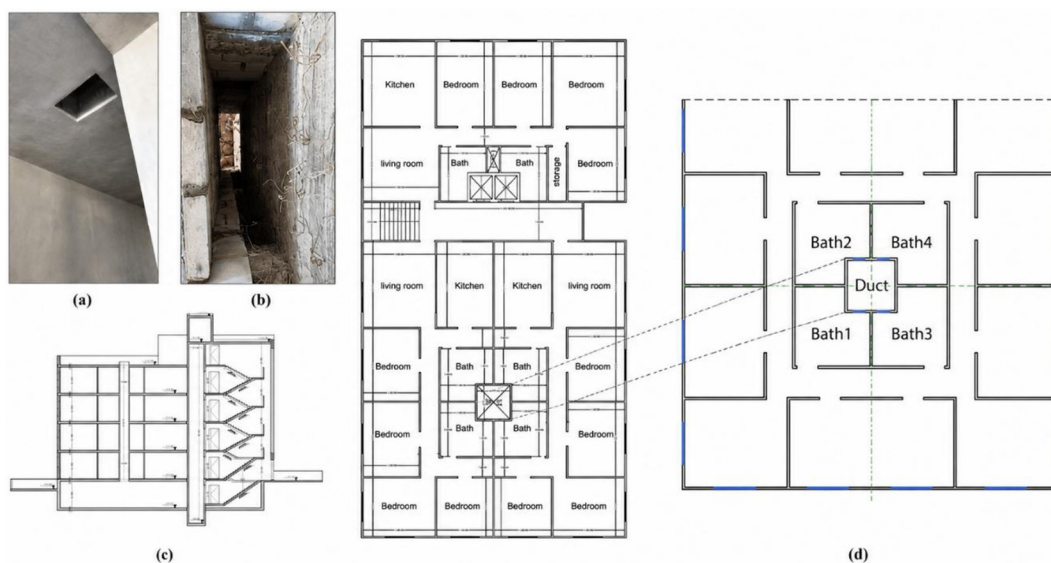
Field and geometric references for the studied ventilation shaft: (a) existing duct opening, (b) shaft view, (c) building section with vertical duct, and (d) plan of four bathrooms connected to a shared duct
